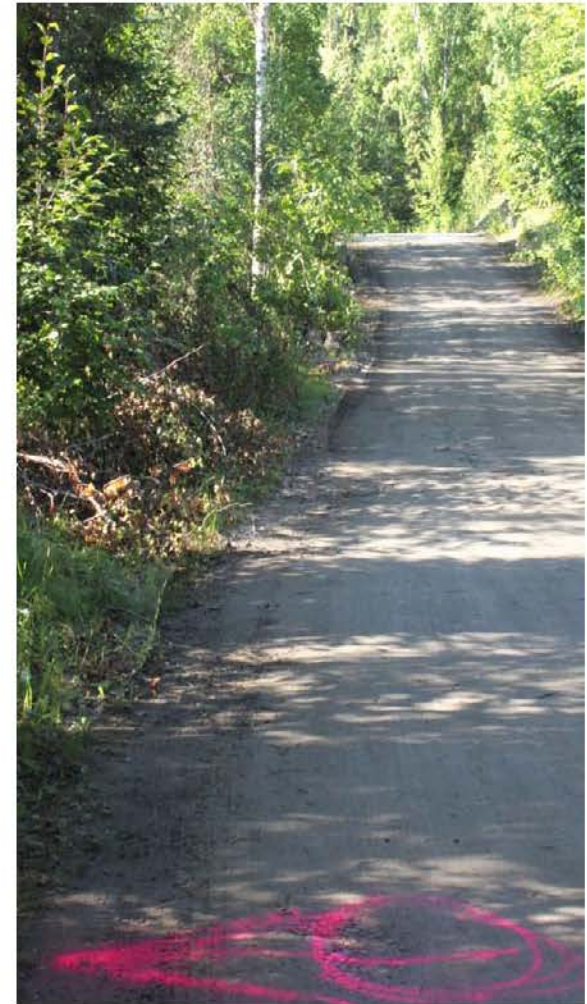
This rock fill section, without culverts, shows construction requirements for the upgrade.
